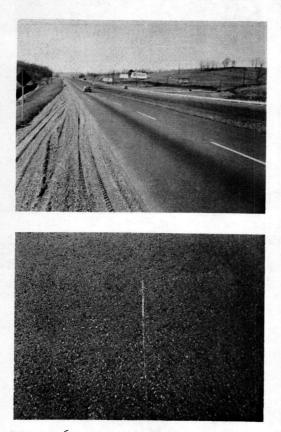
General view of eastbound roadway (upper), and detail of typical pavement surface (lower) - US 40E.
